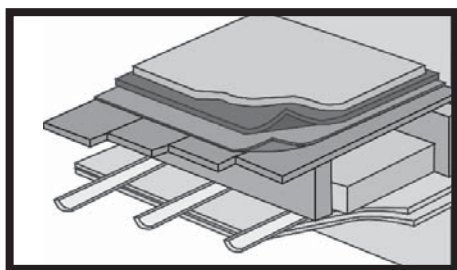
This construction system consists of a floor made of wooden planks secured by means of nails to a lattice of stringers. Installation of this construction system is similar to installation on hardwood - Fig.39: follow the instructions provided.
